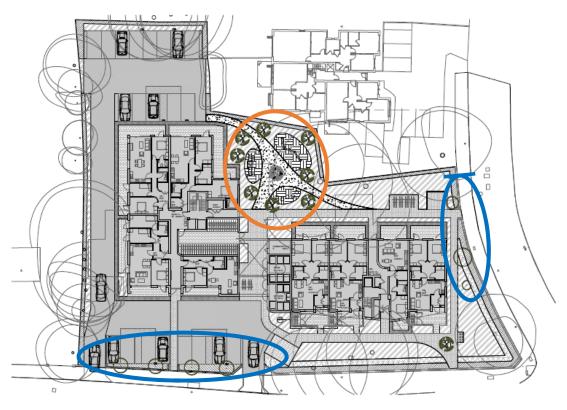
Indicative landscaping layout plan with proposed tree replacements.
